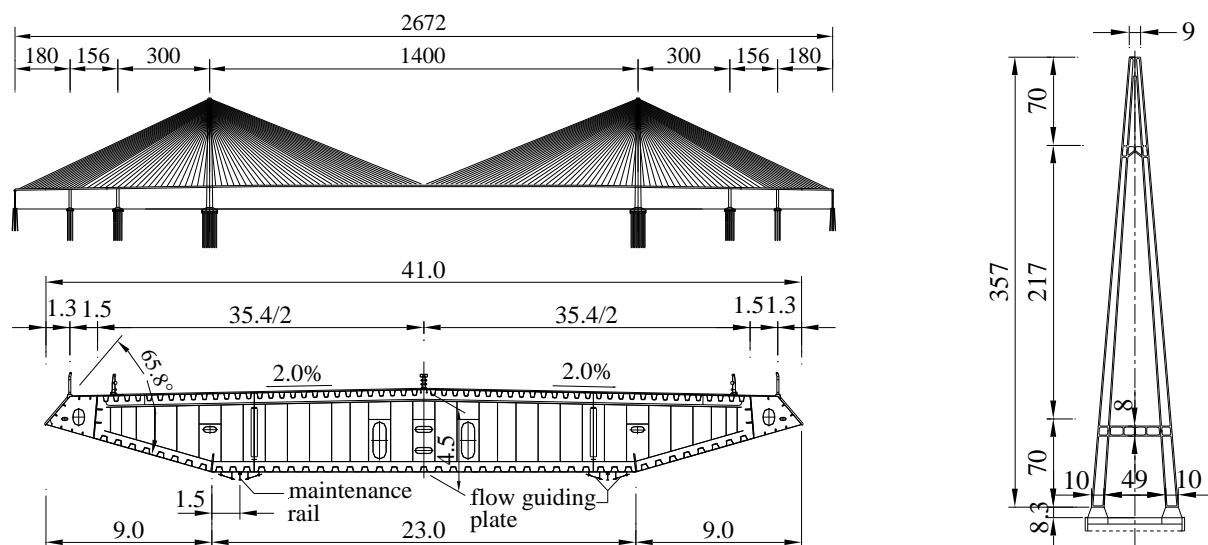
General arrangement of a single 1,400m span cable-stayed bridge (unit: m)
